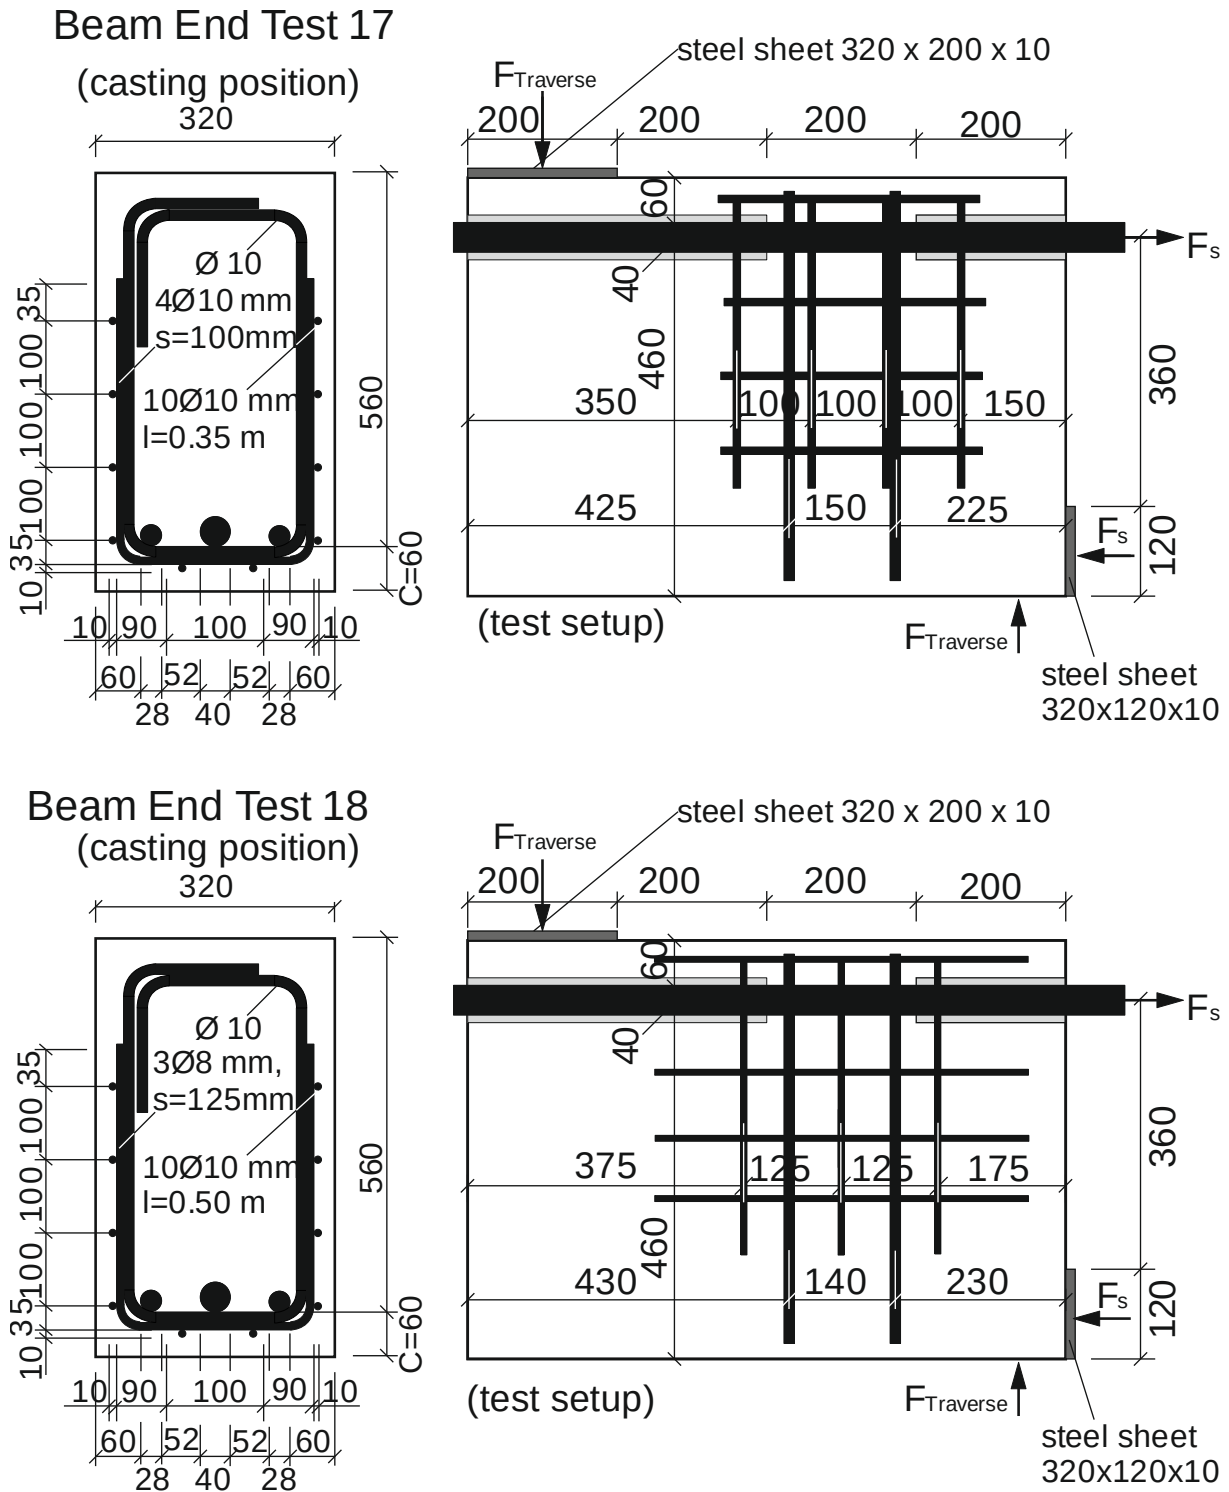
Reinforcement layout of Beam-End Tests 17 and 18
